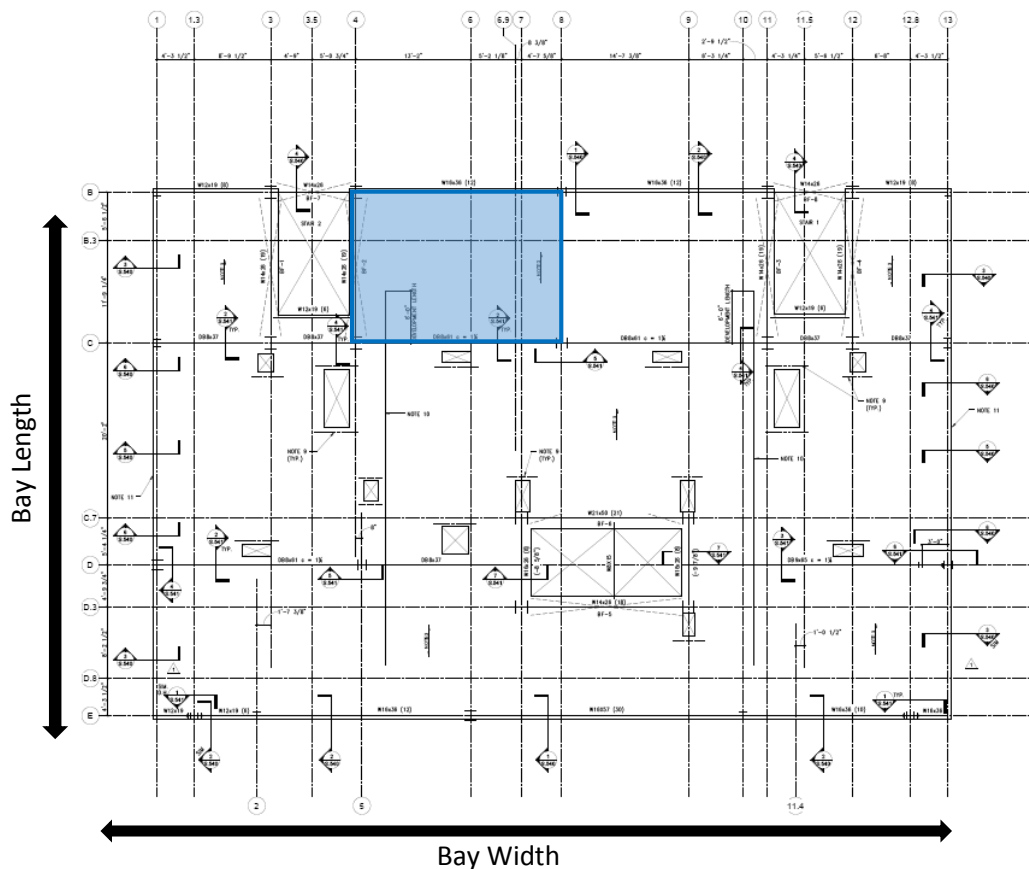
Typical Framing plan showing irregular structural grid. The average bay size (24'x17.5') is highlighted above.
